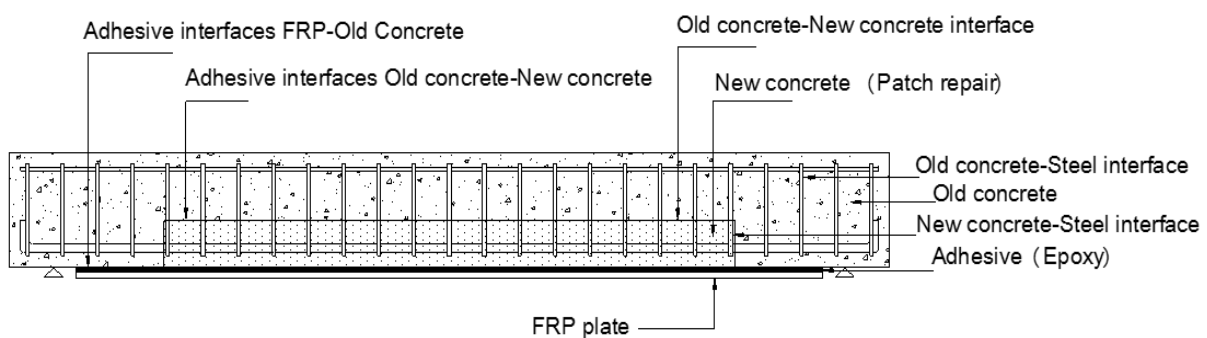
Typical labelled FRP-strengthened RC beam with concrete patch repair.
